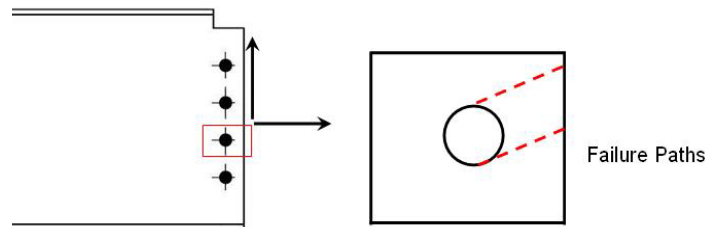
Bearing Failure with Different Length Shear Paths
